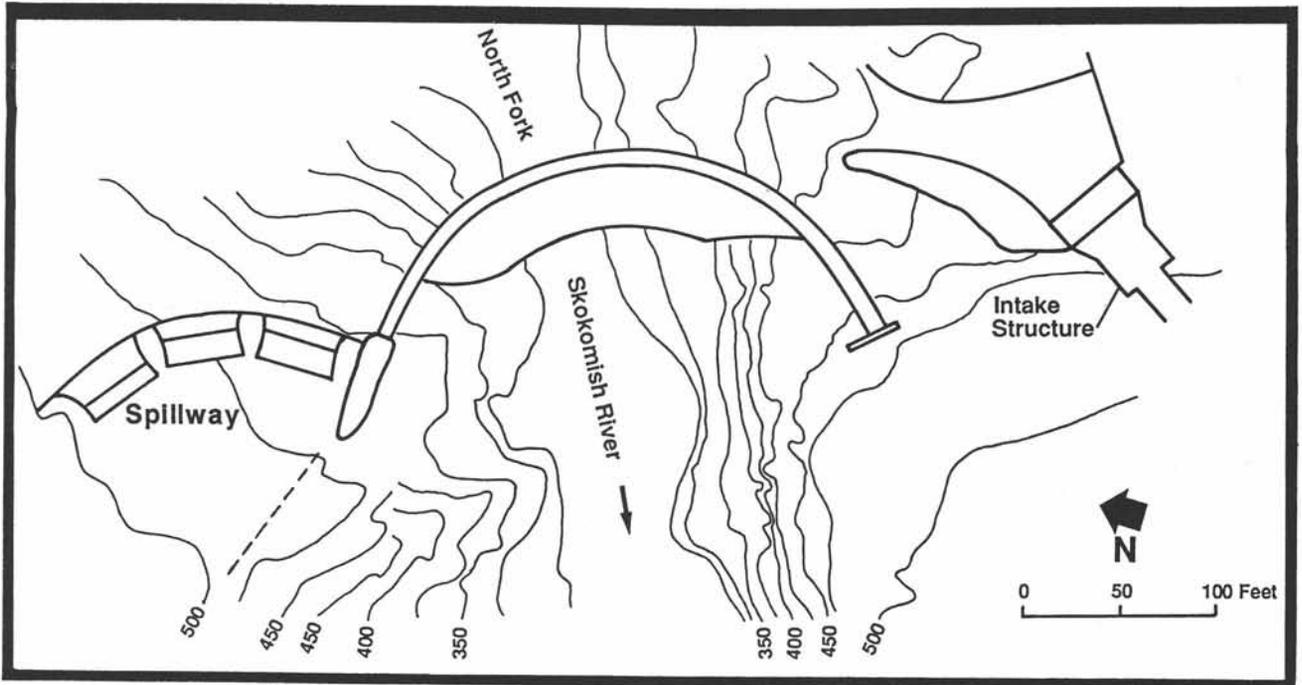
Plan of Cushman Dam No. 2. Dashed line across spillway is trace of small crack in spillway floor.
